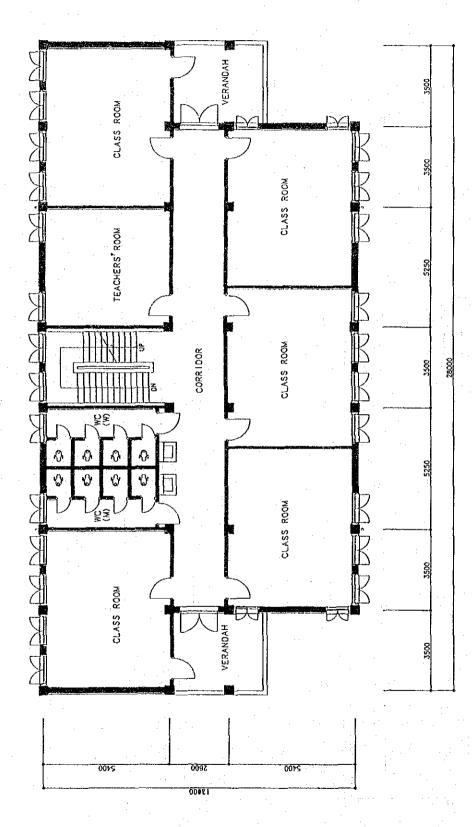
(2) FIRST FLOOR PLAN (5-CLASSROOM TYPE)
